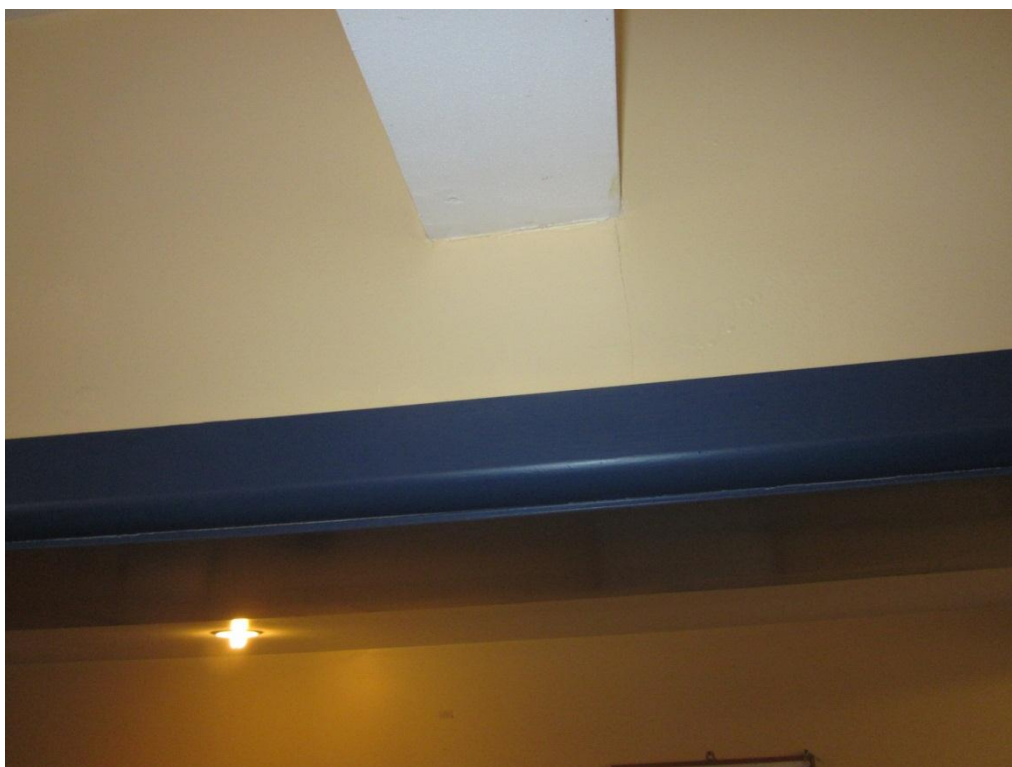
Cracking along the construction joint between the original building and 1971 extension on the south-east wall.
